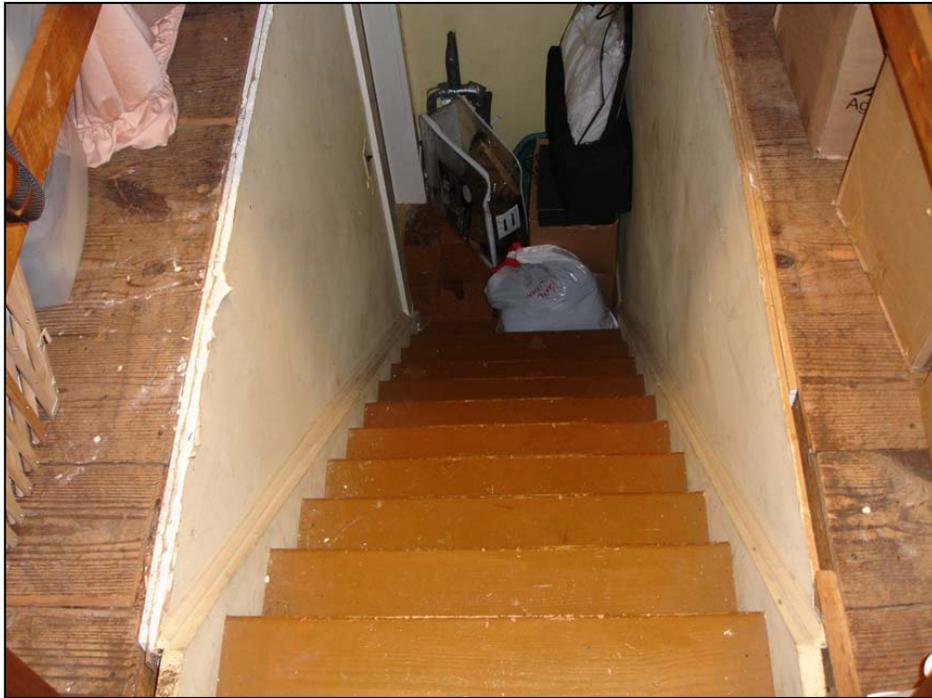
Gray Cottage, attic staircase added in 1964, 2009.
